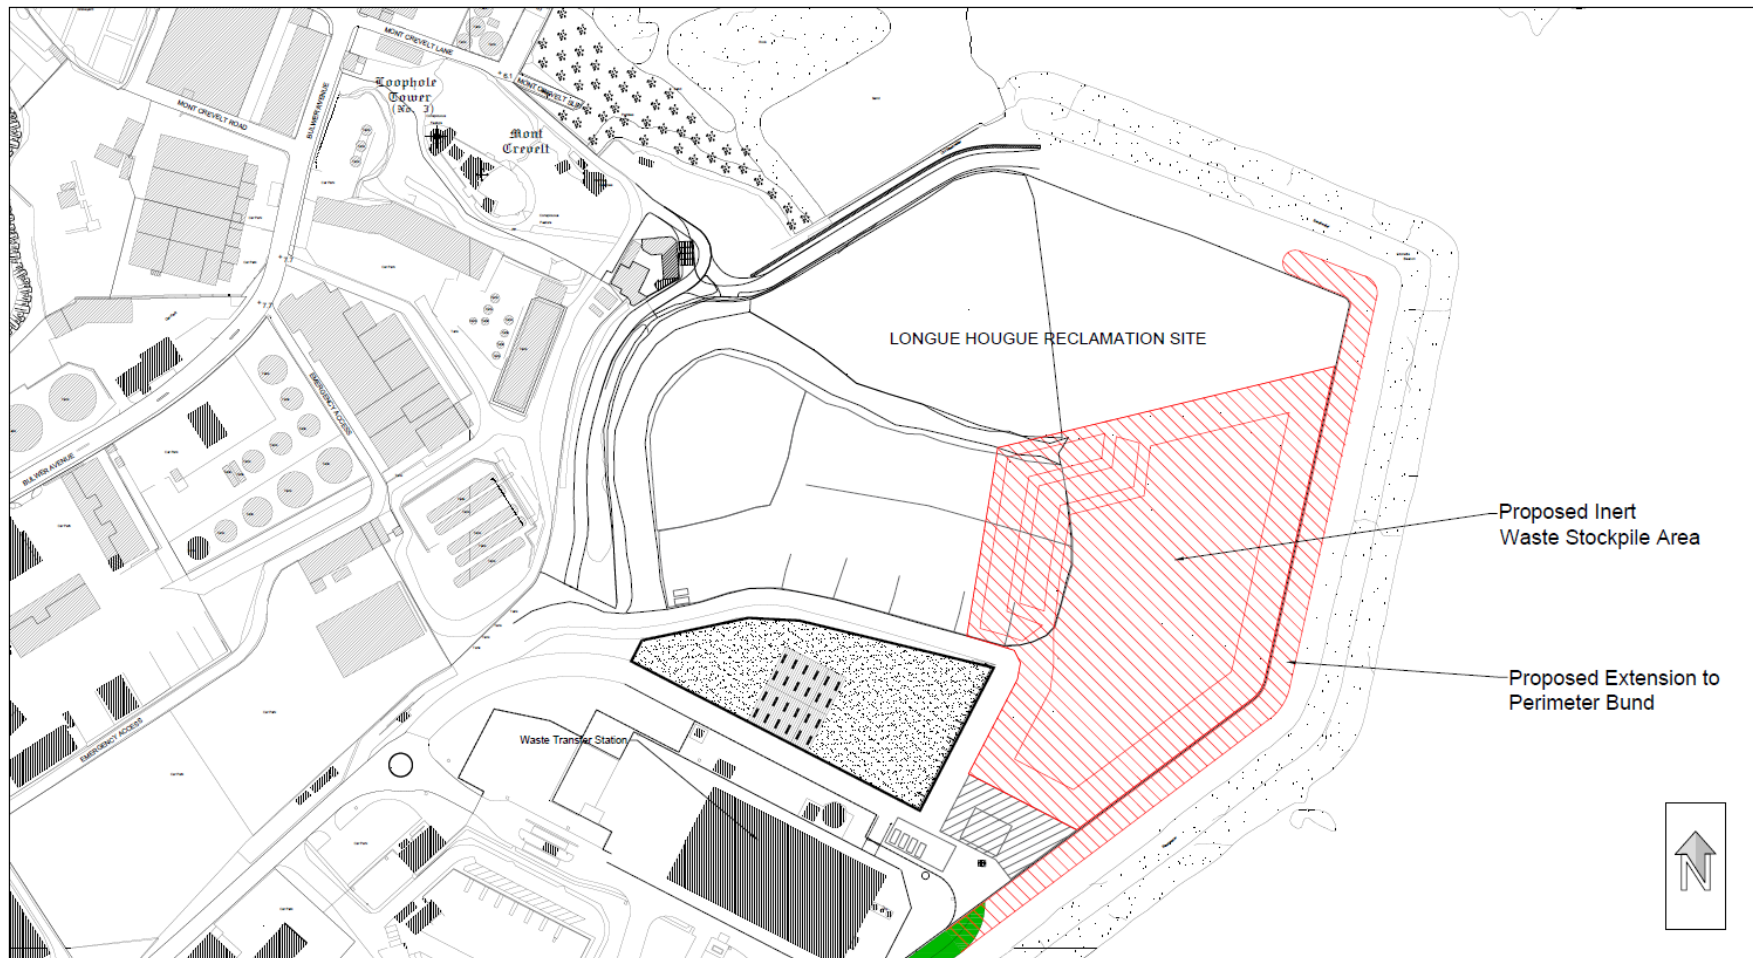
Layout of Longue Hougue site showing proposed stockpile location and extended bund
